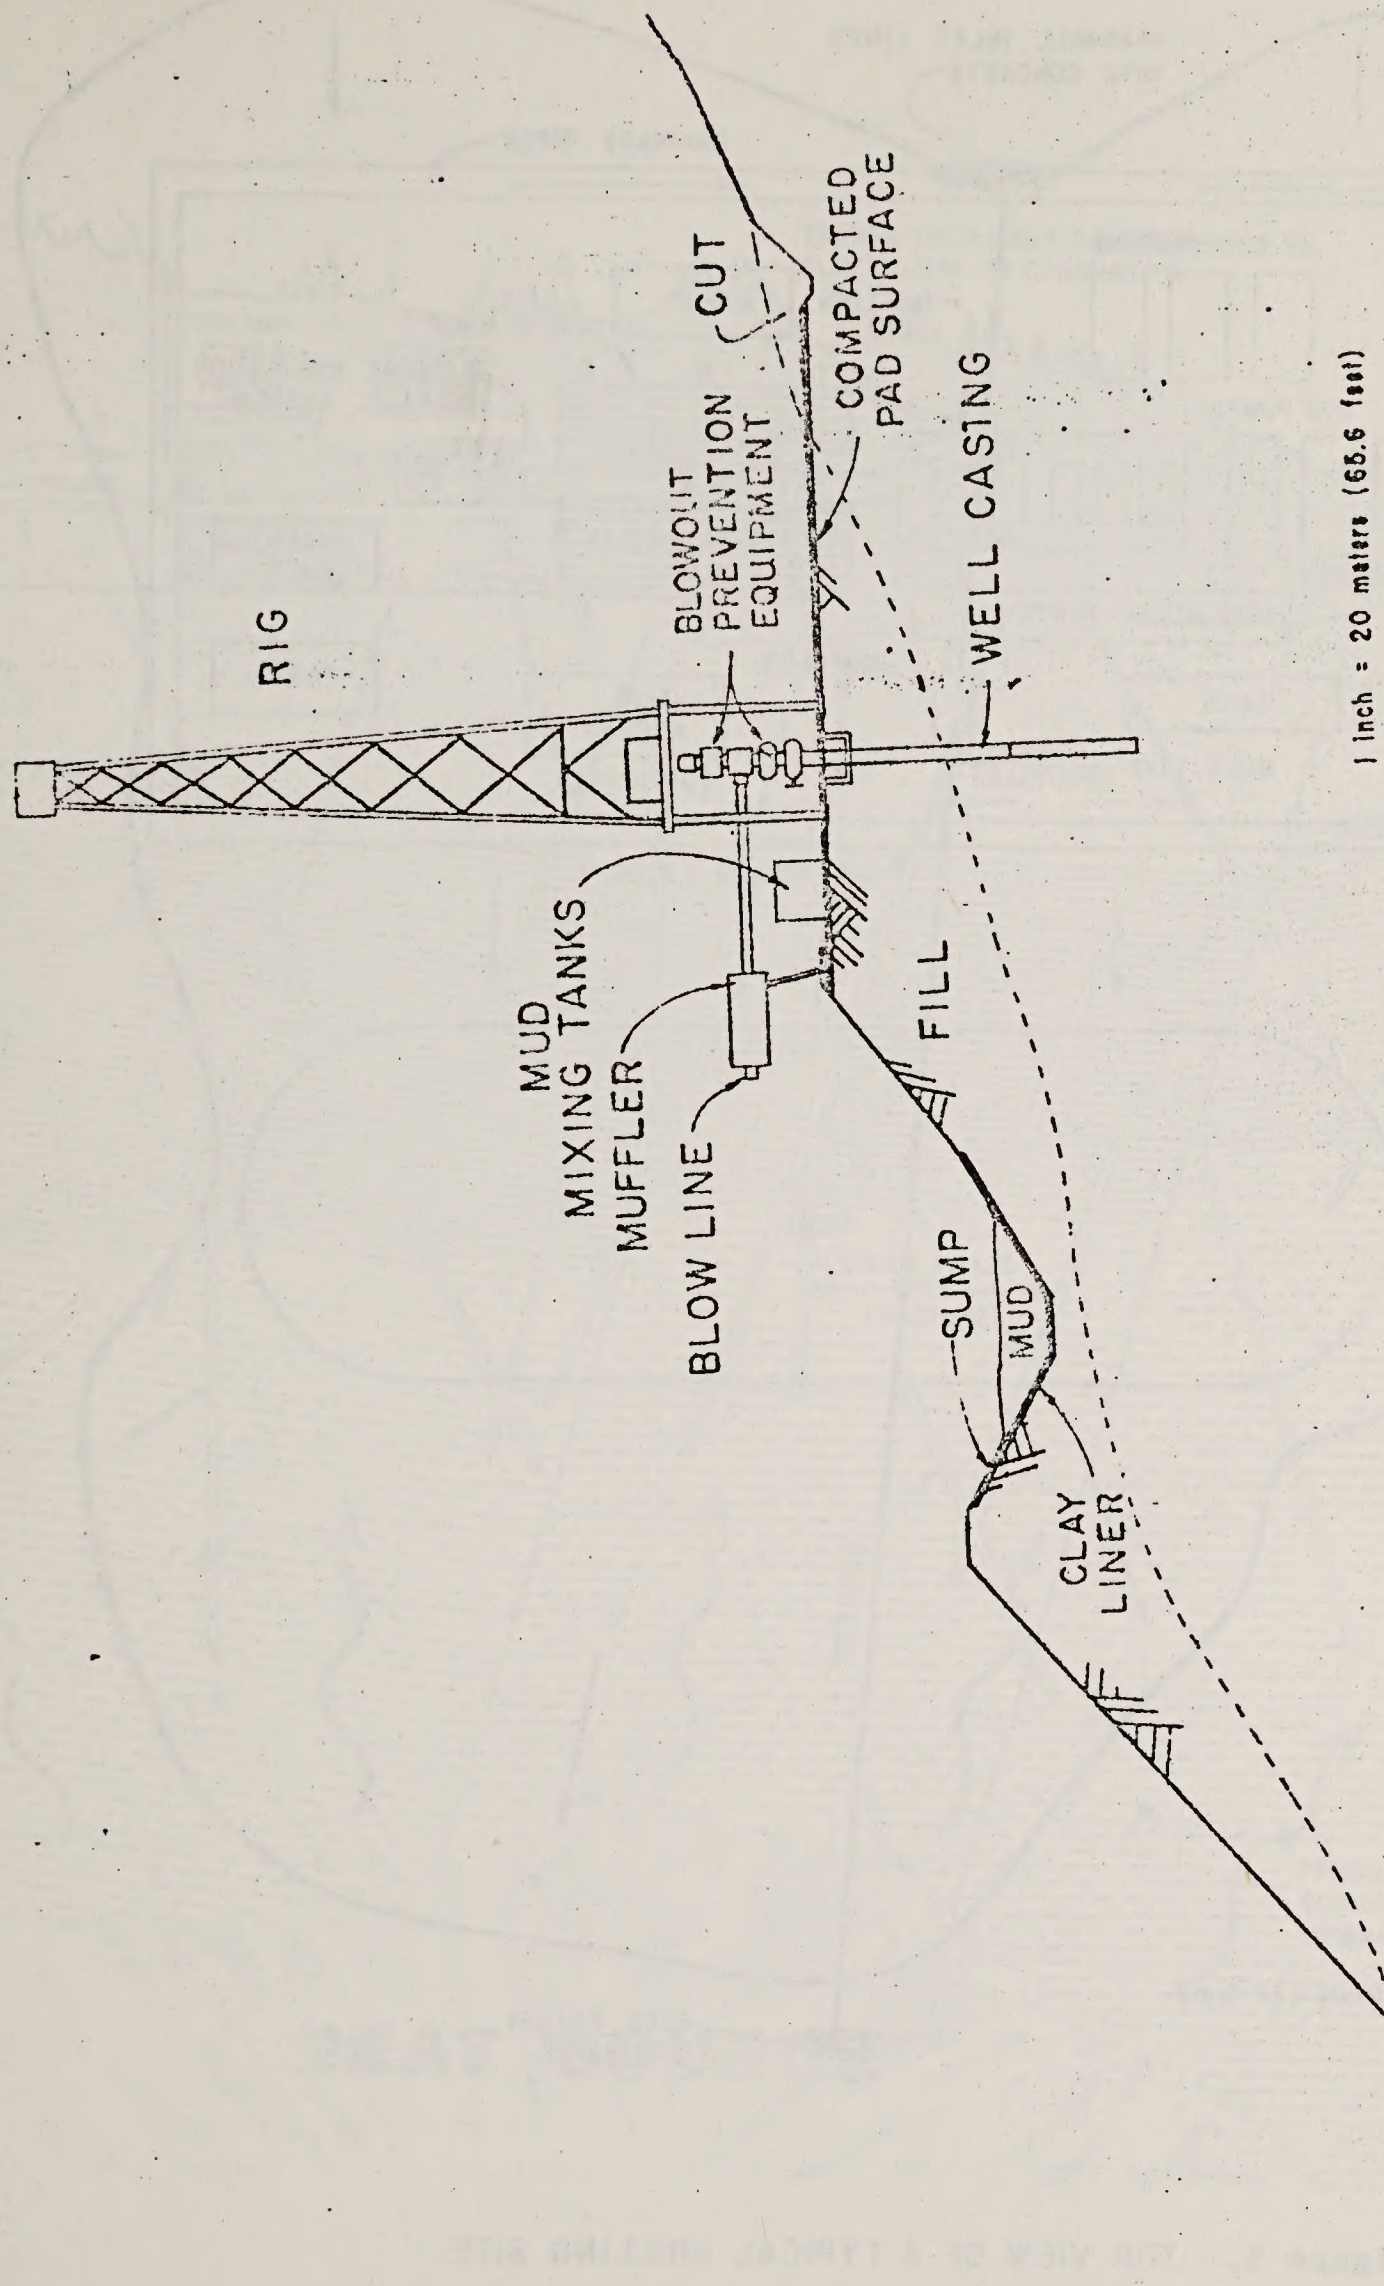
CROSS SECTION THROUGH TYPICAL DRILLING SITE
